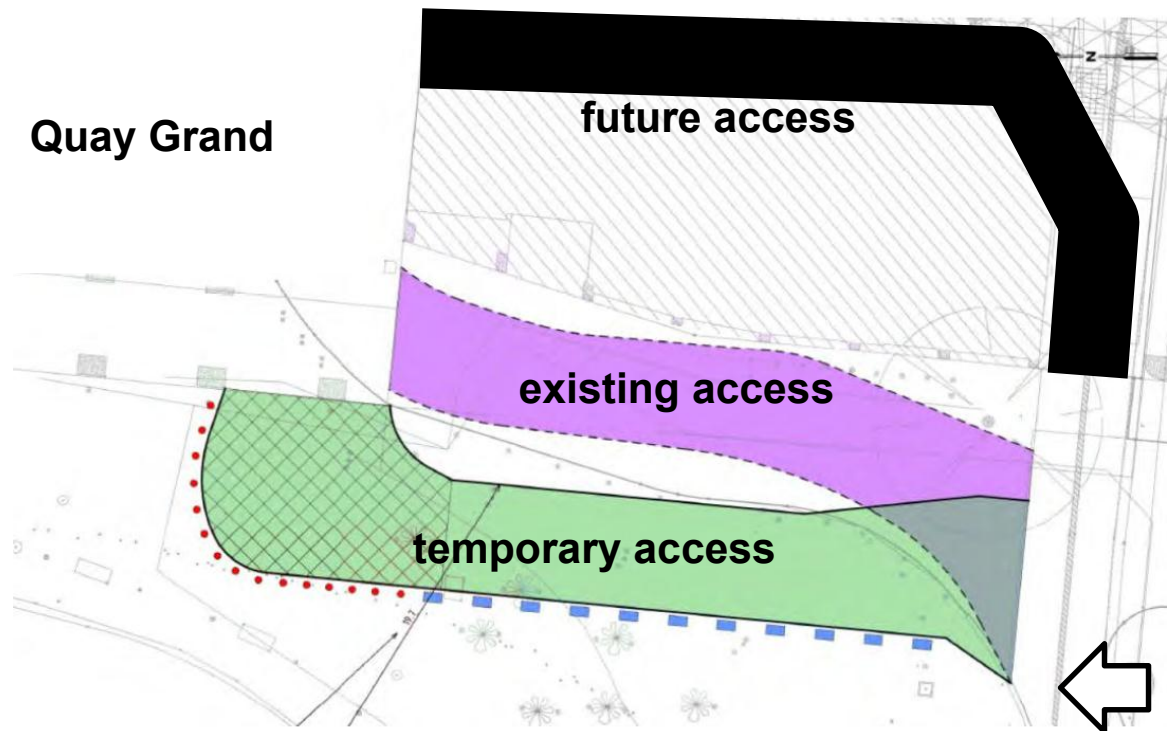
Diagram illustrating the existing, temporary and proposed future access to Quay Grand development.
